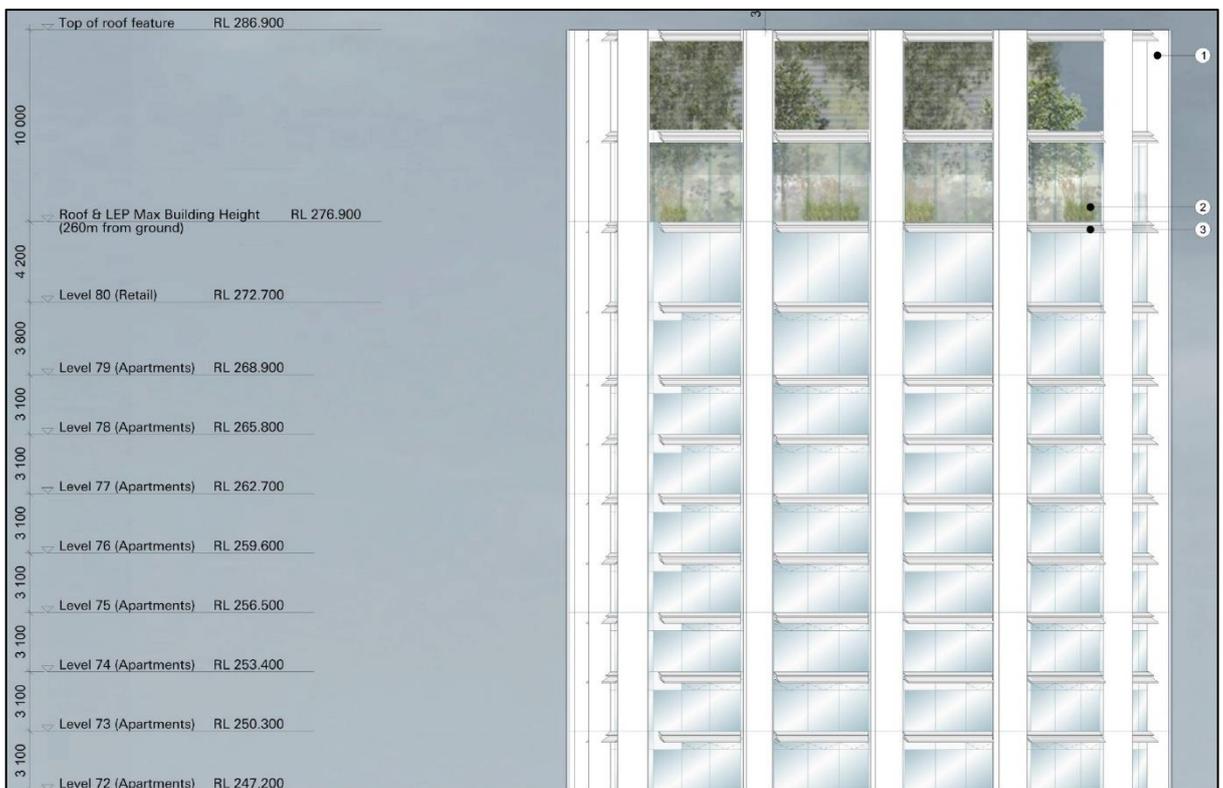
East (George Street) elevation showing levels 72 to the top of the building / architectural roof feature
